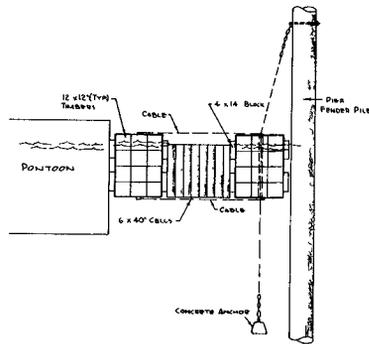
Hi-Dro Cushion Camel Layout- Half Plan
